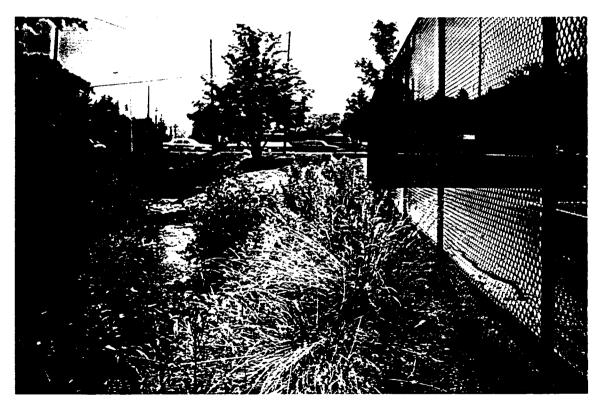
Looking downstream at arch culvert under Rivers Street at US 321. Note ASU tennis courts adjacent to Boone Creek channel.
